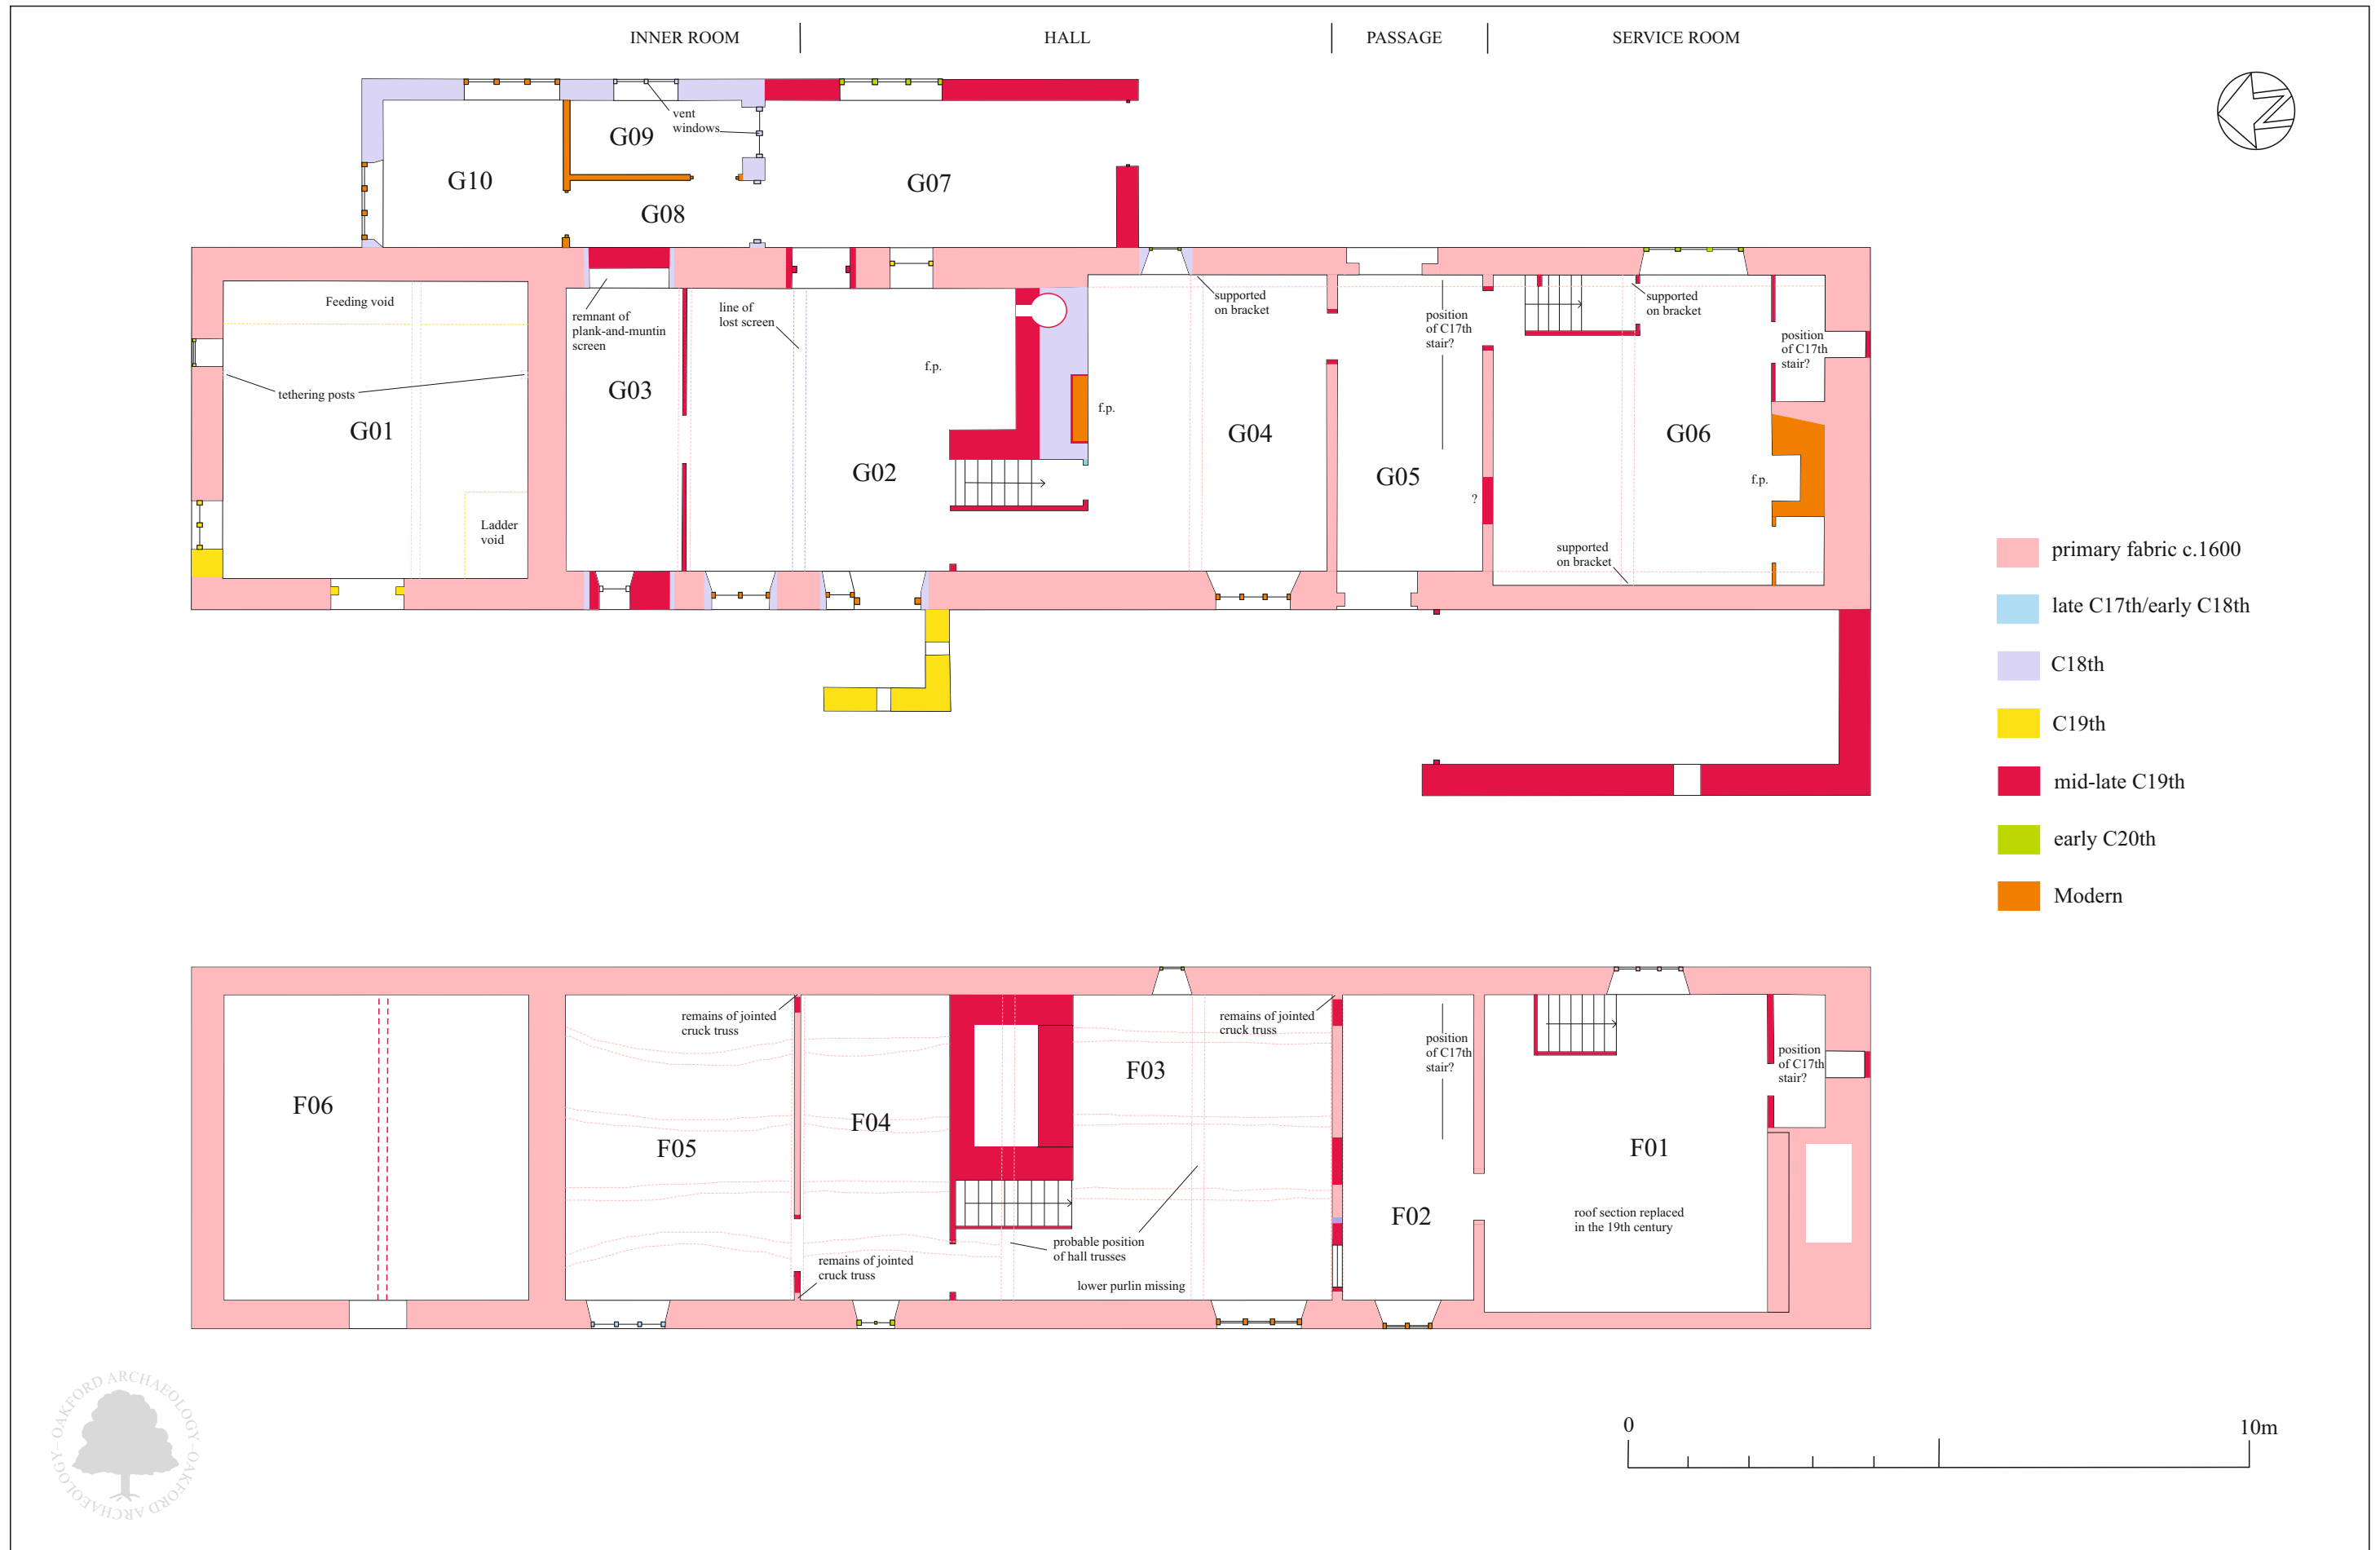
Plan of the ground- and first-floor showing location of observations and suggested phases of development.
